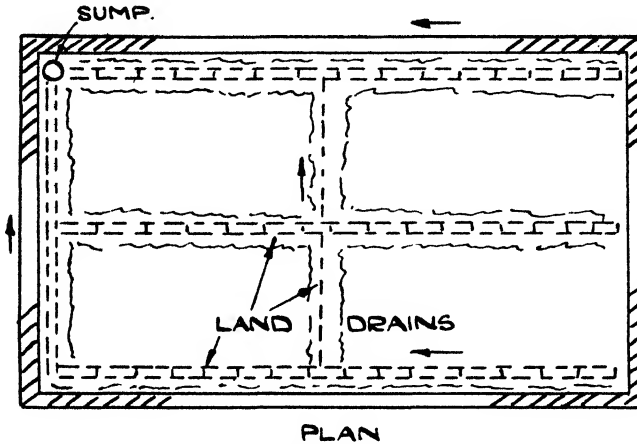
ARRANGEMENT OF DRAINAGE TO SUMP IN RESTRICTED AREA
